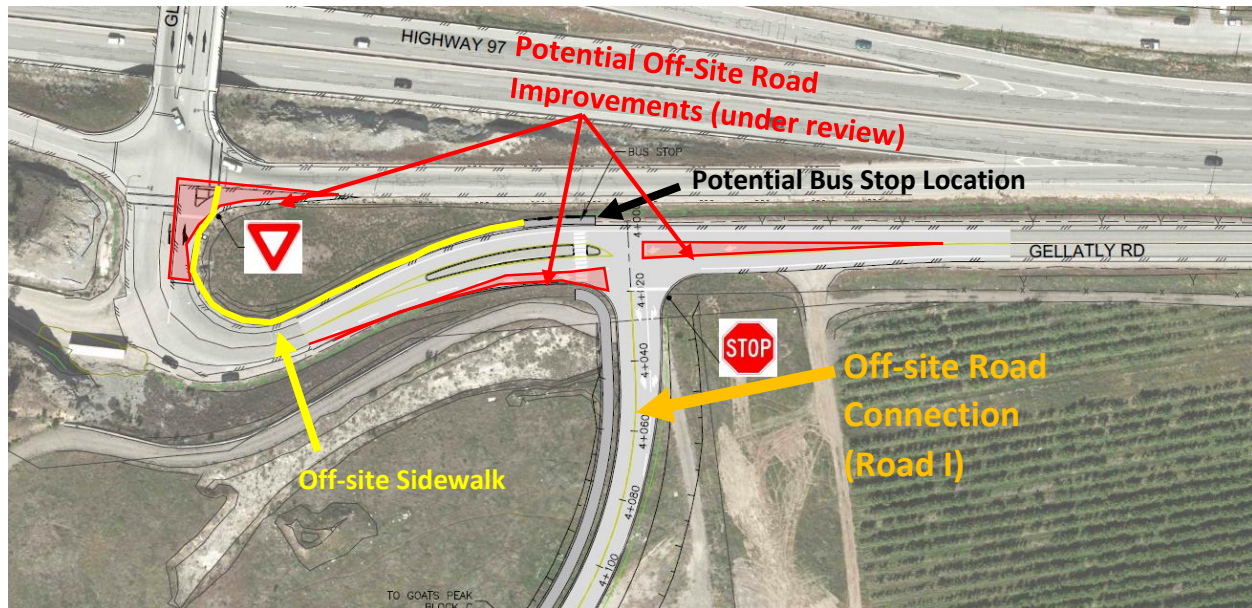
Identified Off-Site Improvements and Road I to Gellatly Road
